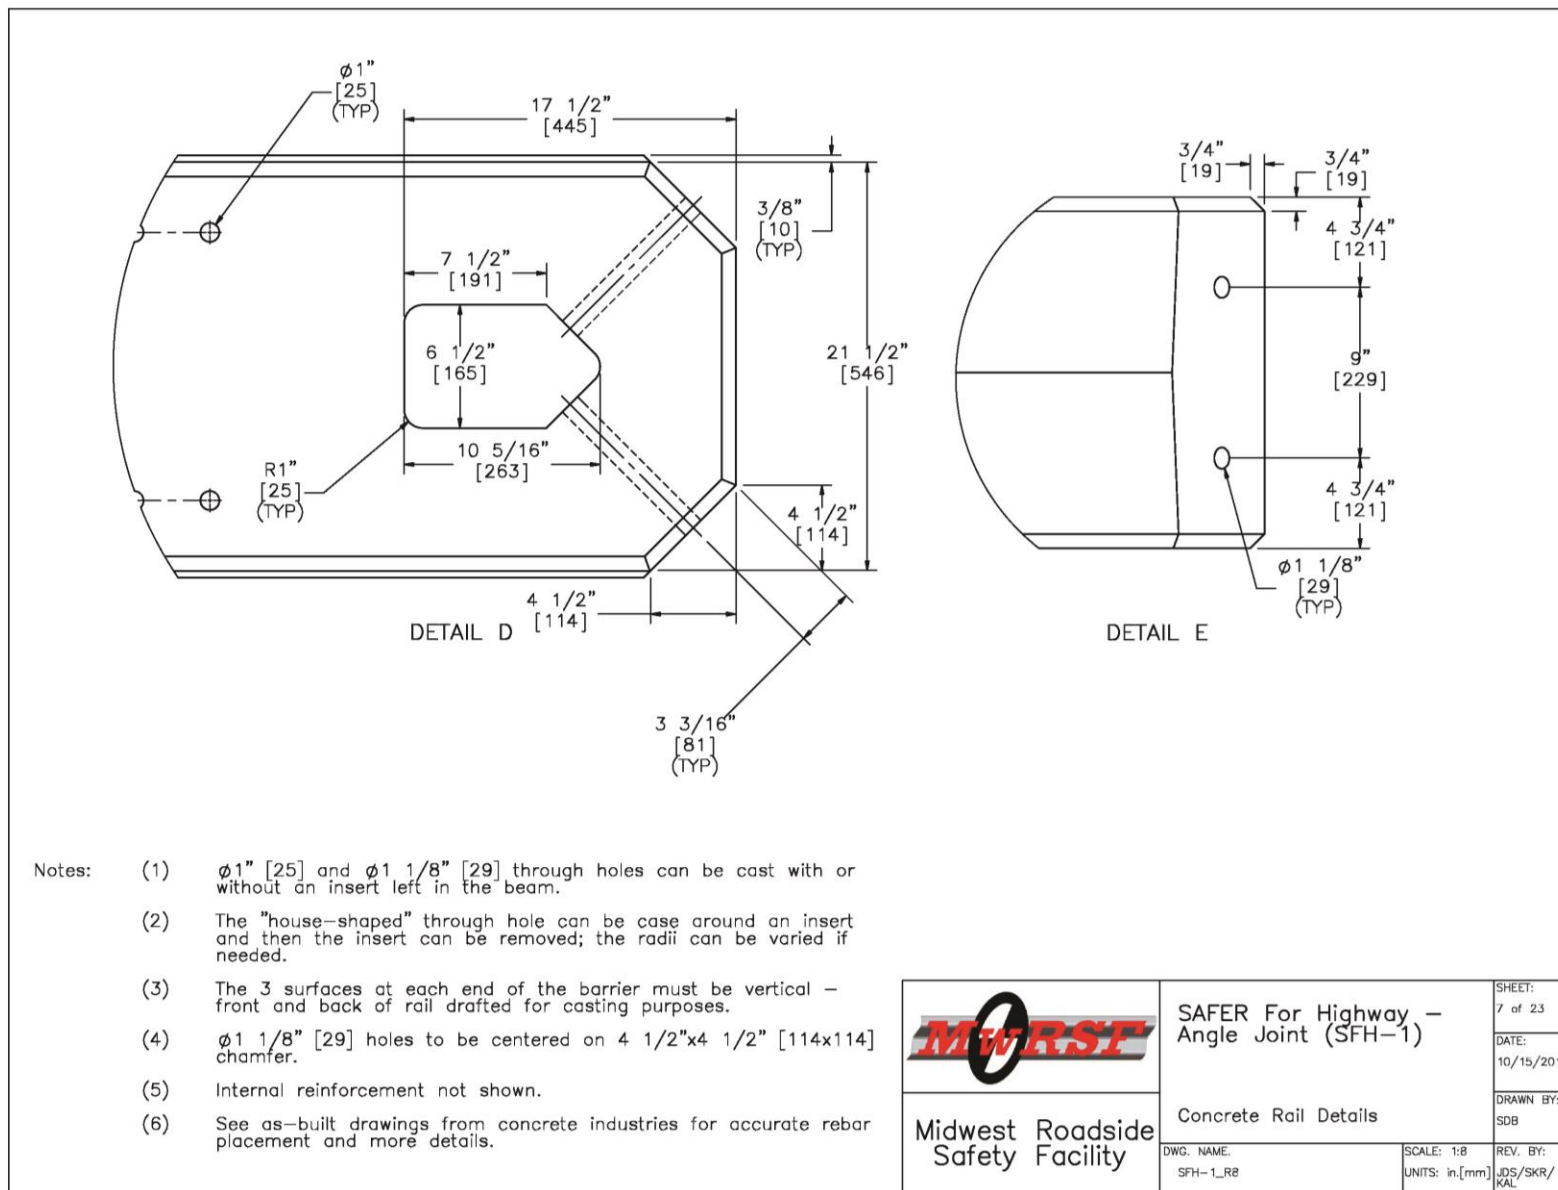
Recommended Barrier Design for Full-Scale Crash Testing, Concrete Rail Details
